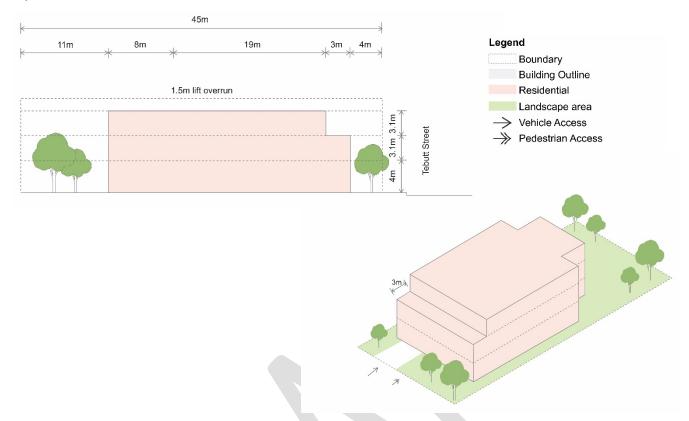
Indicative Beeson, Tebbutt and Hathern Streets - storeys, building envelope, scale and site layout - section and axonometric
